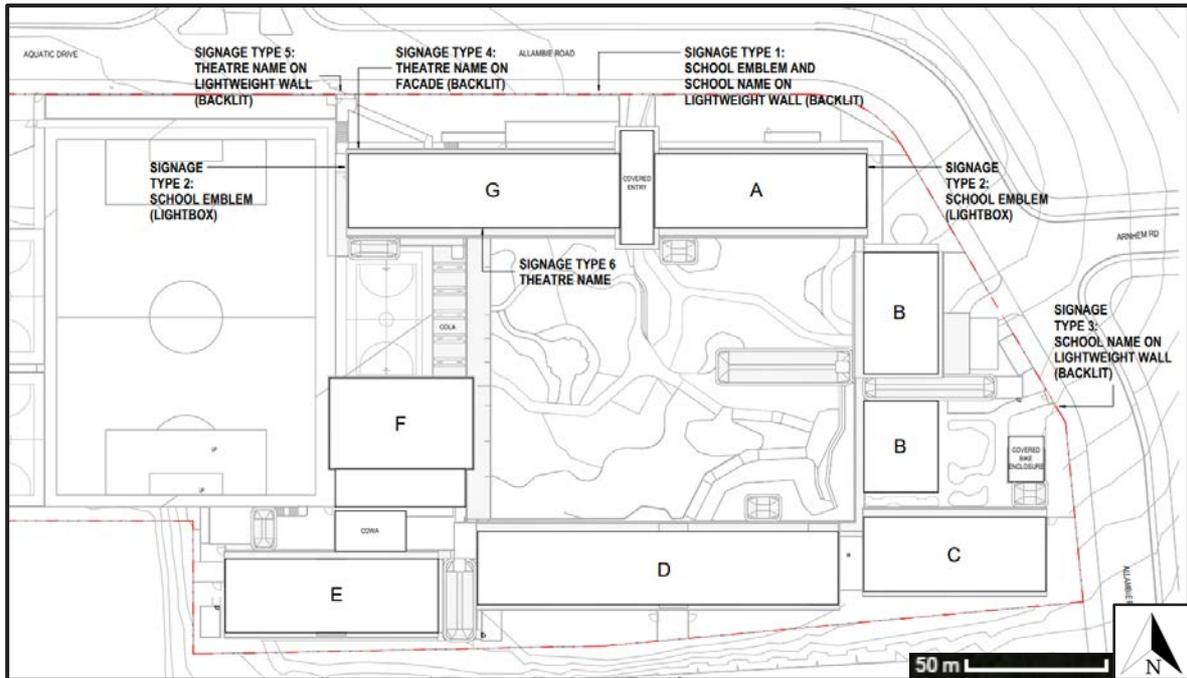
| Proposed signage location plan (Source: Applicant's EIS)
